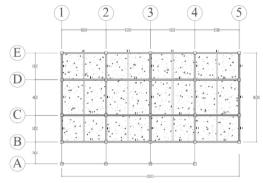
ELV +7000 Structure Plan Source: Author, 2025
